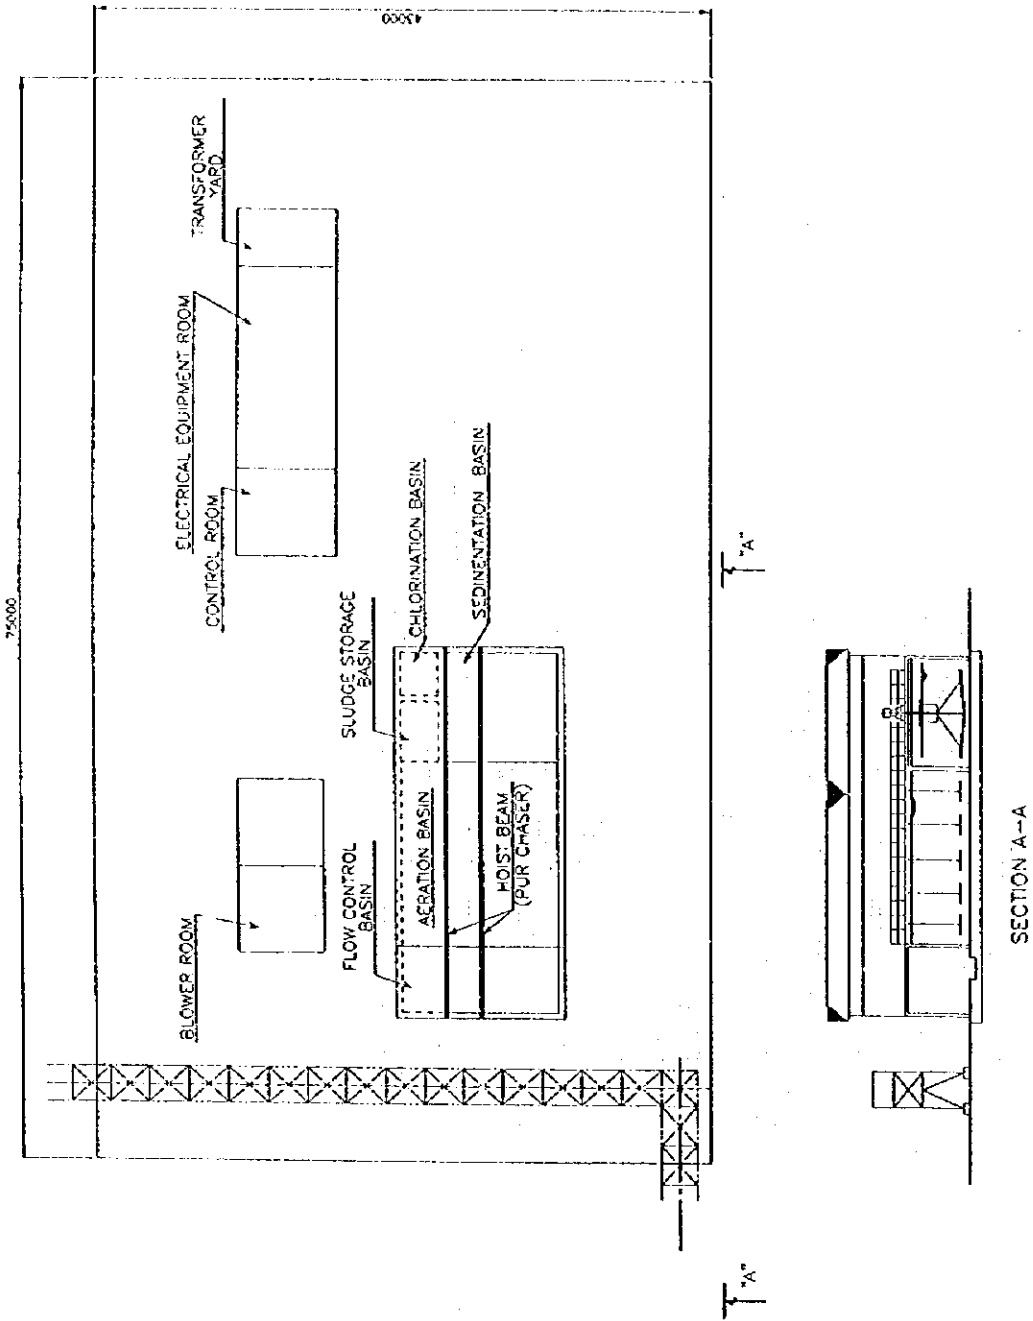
Layout of Live Sewerage Treatment Station
